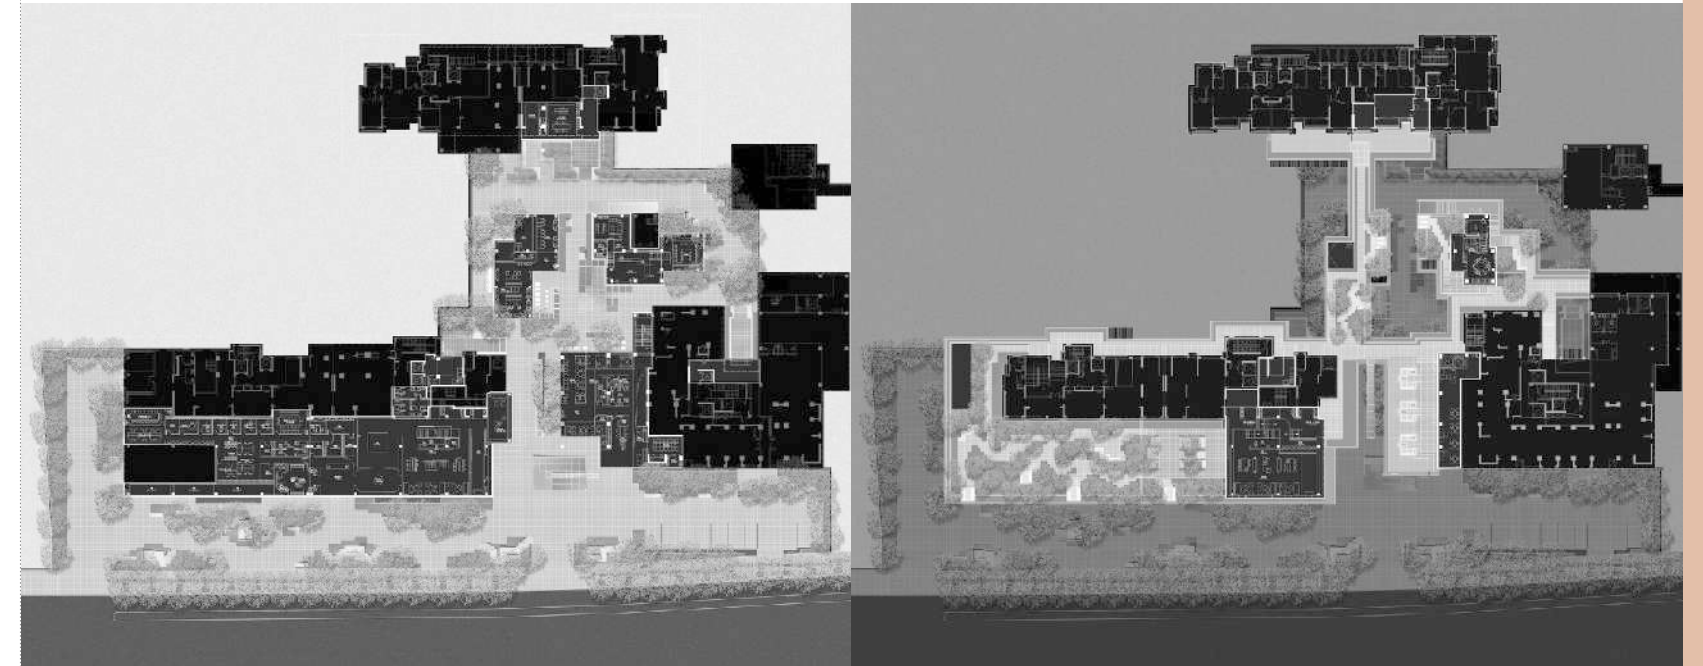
TROP : terrains + open space Plan. Source : ArchDaily
